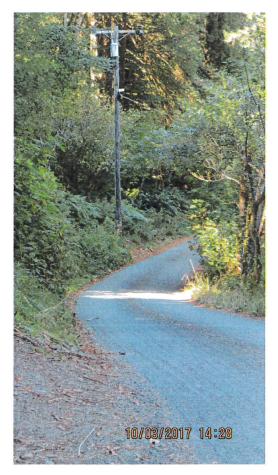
Milepost 0.47. From crest, looking toward EOP (end of project); 10% favorable slope. Sight distance less than 70 feet. Driveway intersects on left.
